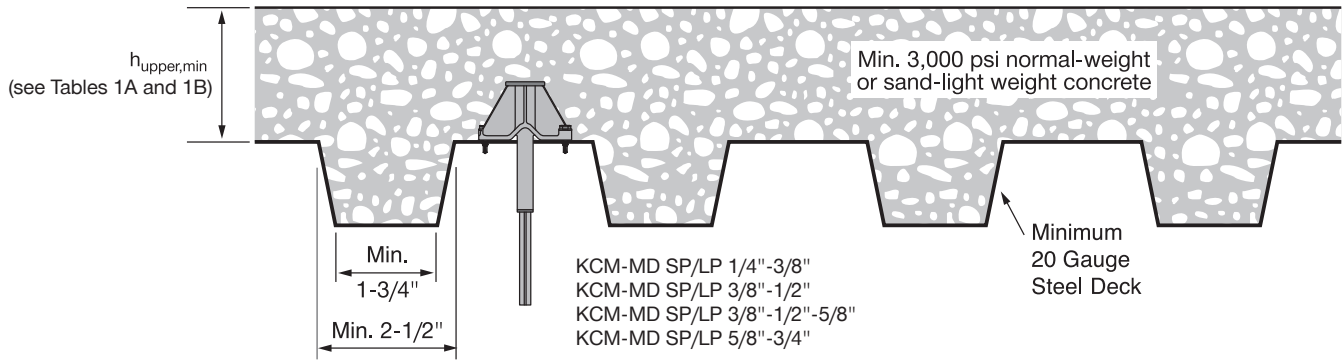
A —Installation in the soffits of concrete filled metal deck floor and roof assemblies-over upper flute (B-deck and W-deck)
